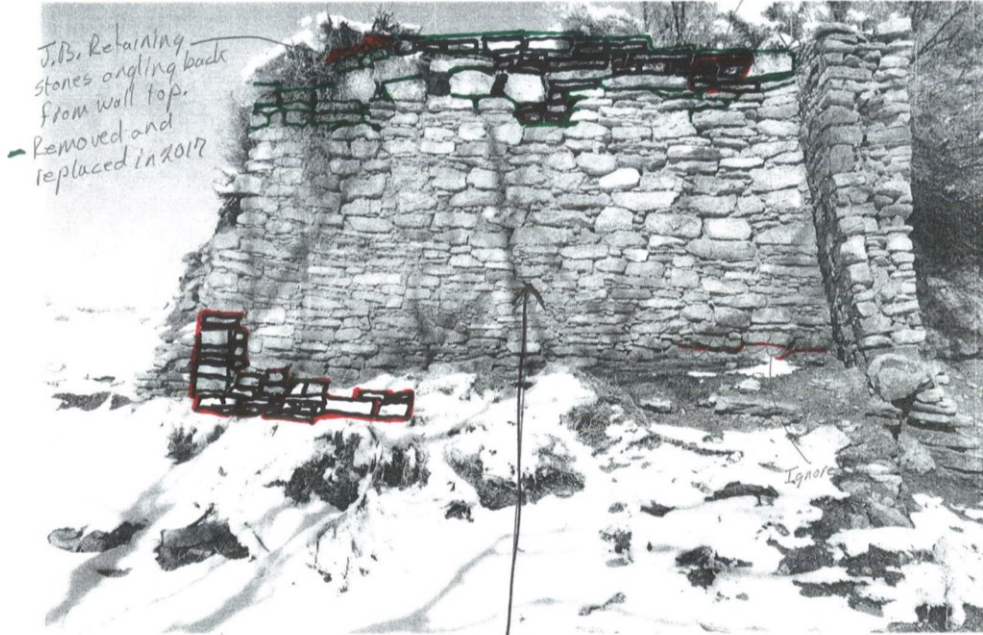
West great house, the Haynie site; masonry walls stabilized during the 2017 field season are highlighted in green.
